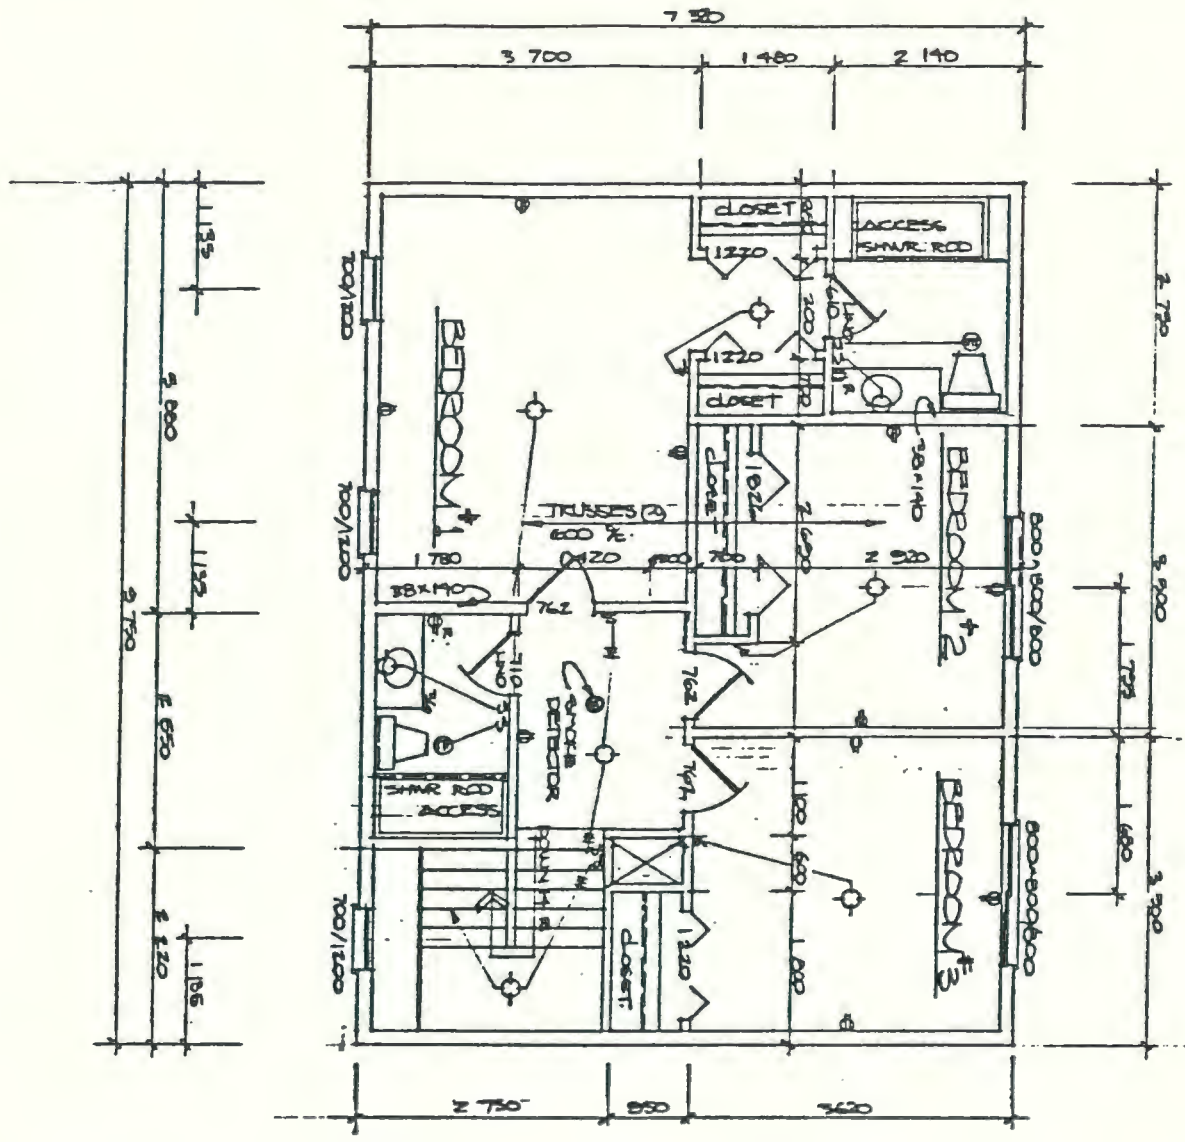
Second Floor Plan - Alberta Demonstration House
